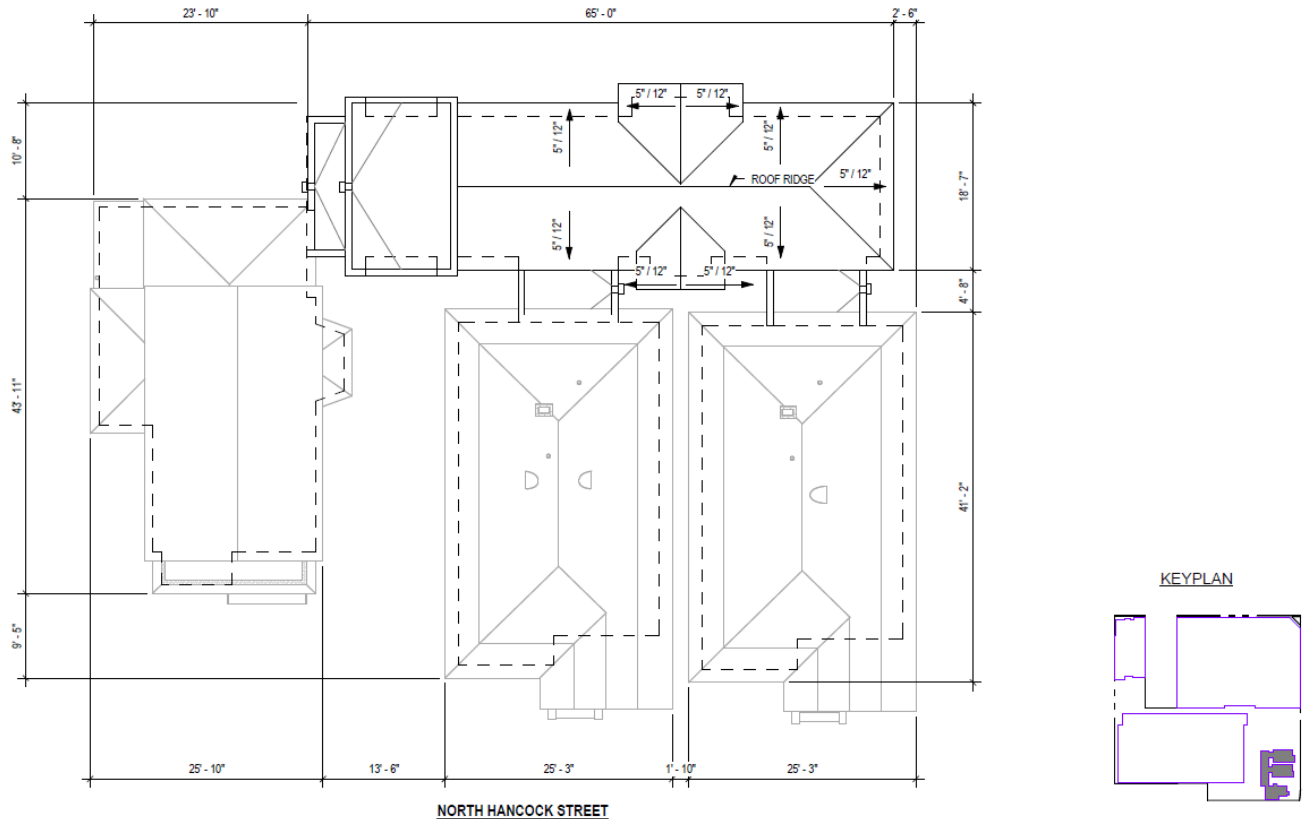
Schematic/Design Development, TSM Architects; Site Plan February 2020
